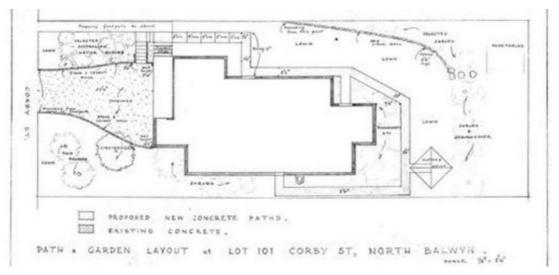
Undated garden layout plan for the subject site. Source: Alistair Knox Foundation, via Heritage Assessment.
